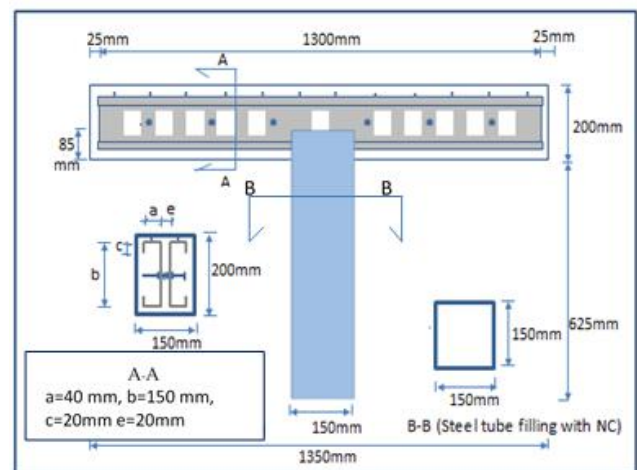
showing the details of test specimen CF-ST1-S and CF-ST4-S
